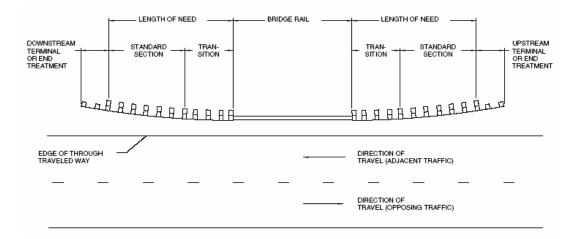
Typical Setting of Bridge Safety Barriers [AASHTO, 2006]
